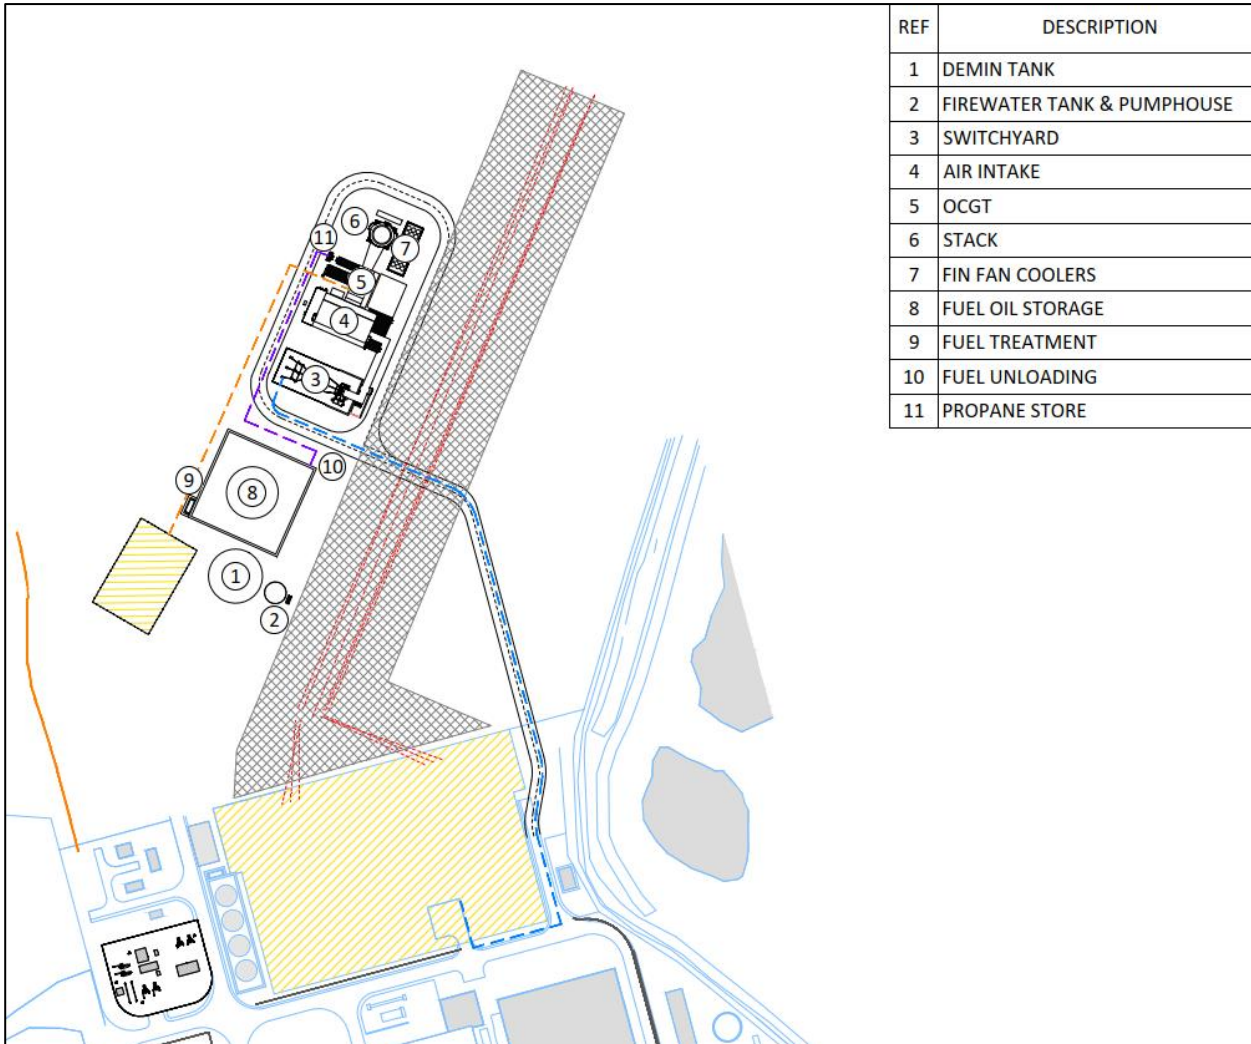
Site Plan – Layout Option Tynagh North Option A
